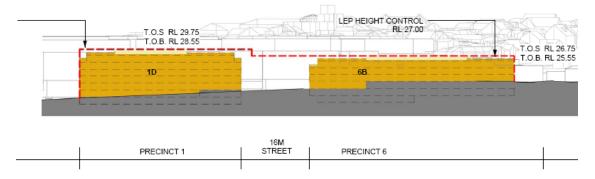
Minogue Crescent elevation of Buildings 1D and 6B.
